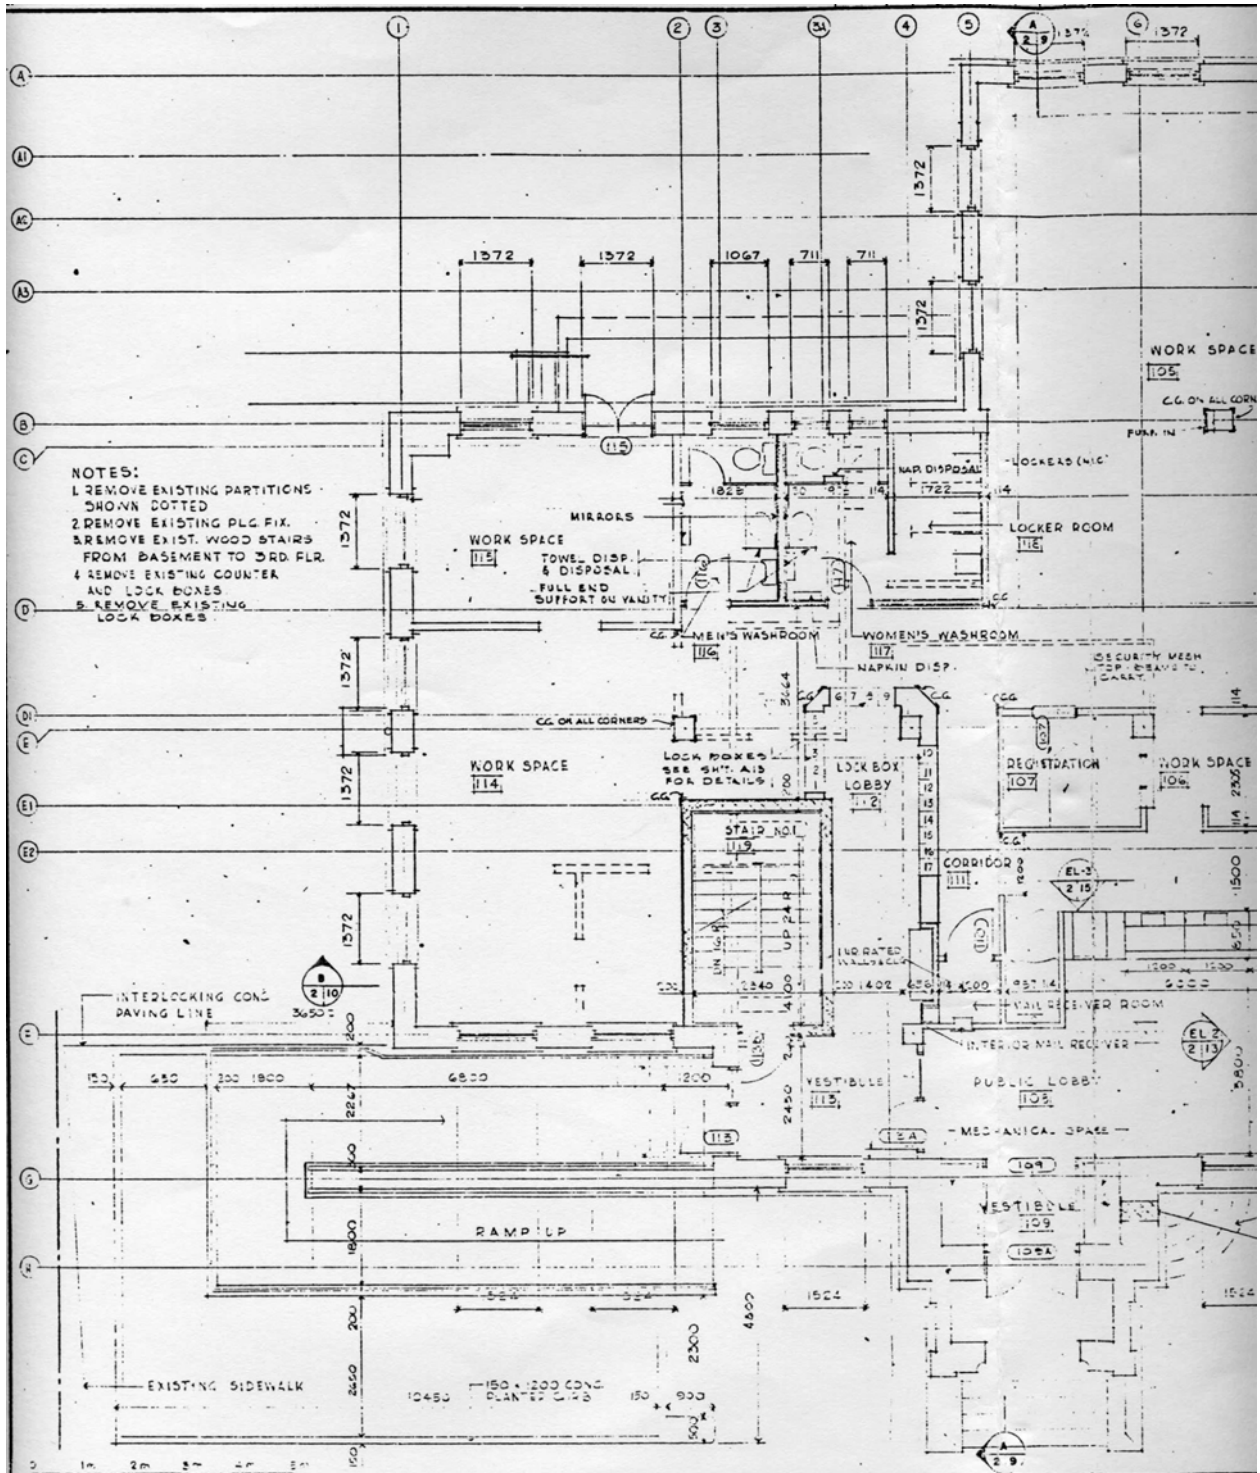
Drawing No. A2: East half of ground floor plan from the 1978 set of drawings for proposed renovations and additions, showing the new central concrete block stairwell, the new Lock Box Lobby, the Mail Receiver Room to the right and behind it the Registration Room.
